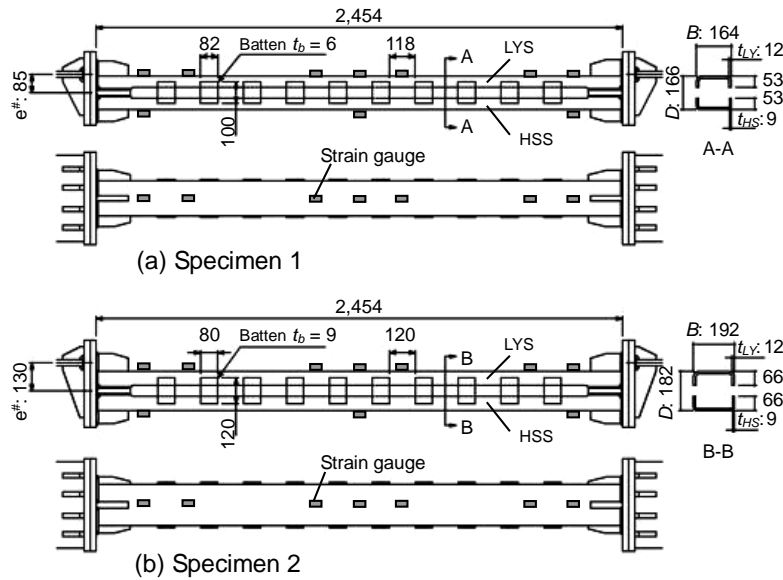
Tested Full-scale NBB specimens (dimensions in mm)
